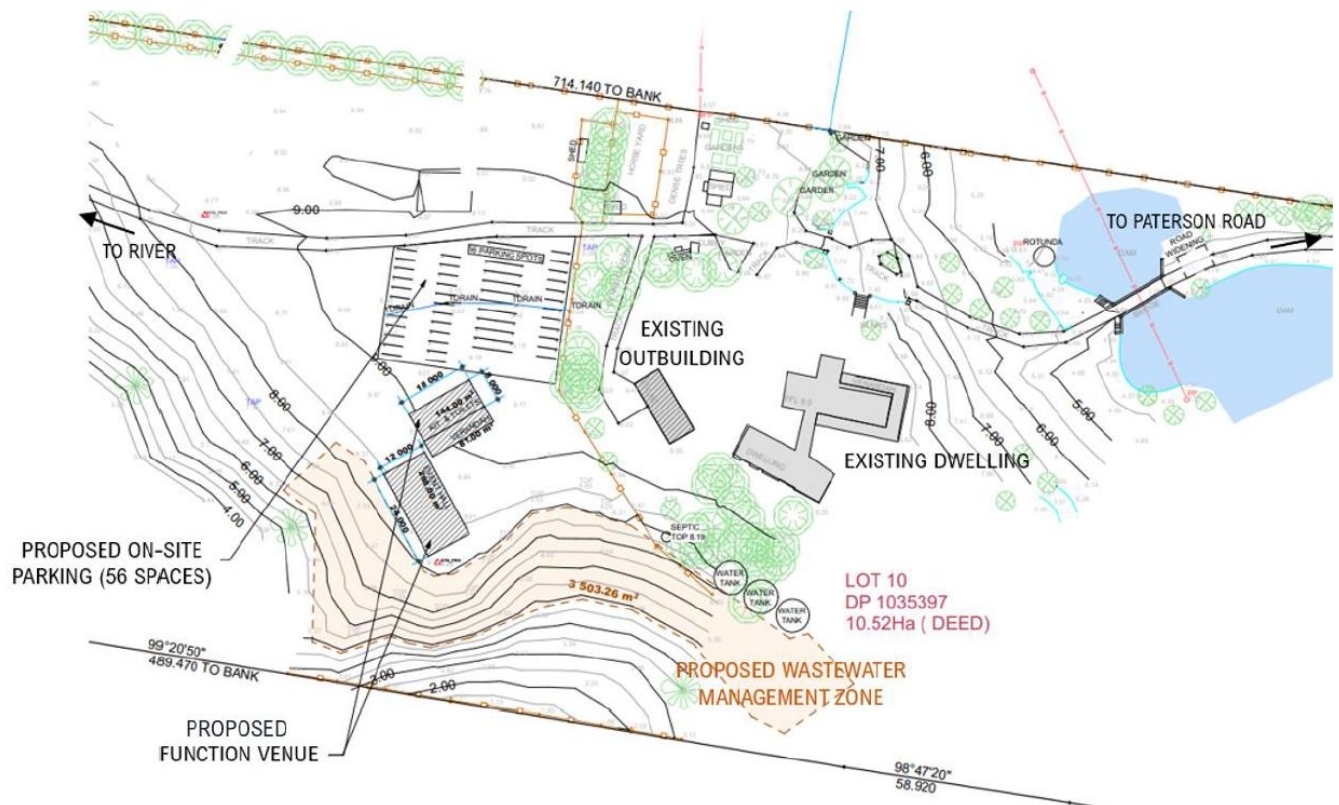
Concept Site Layout (Punchline Property, 2024)
